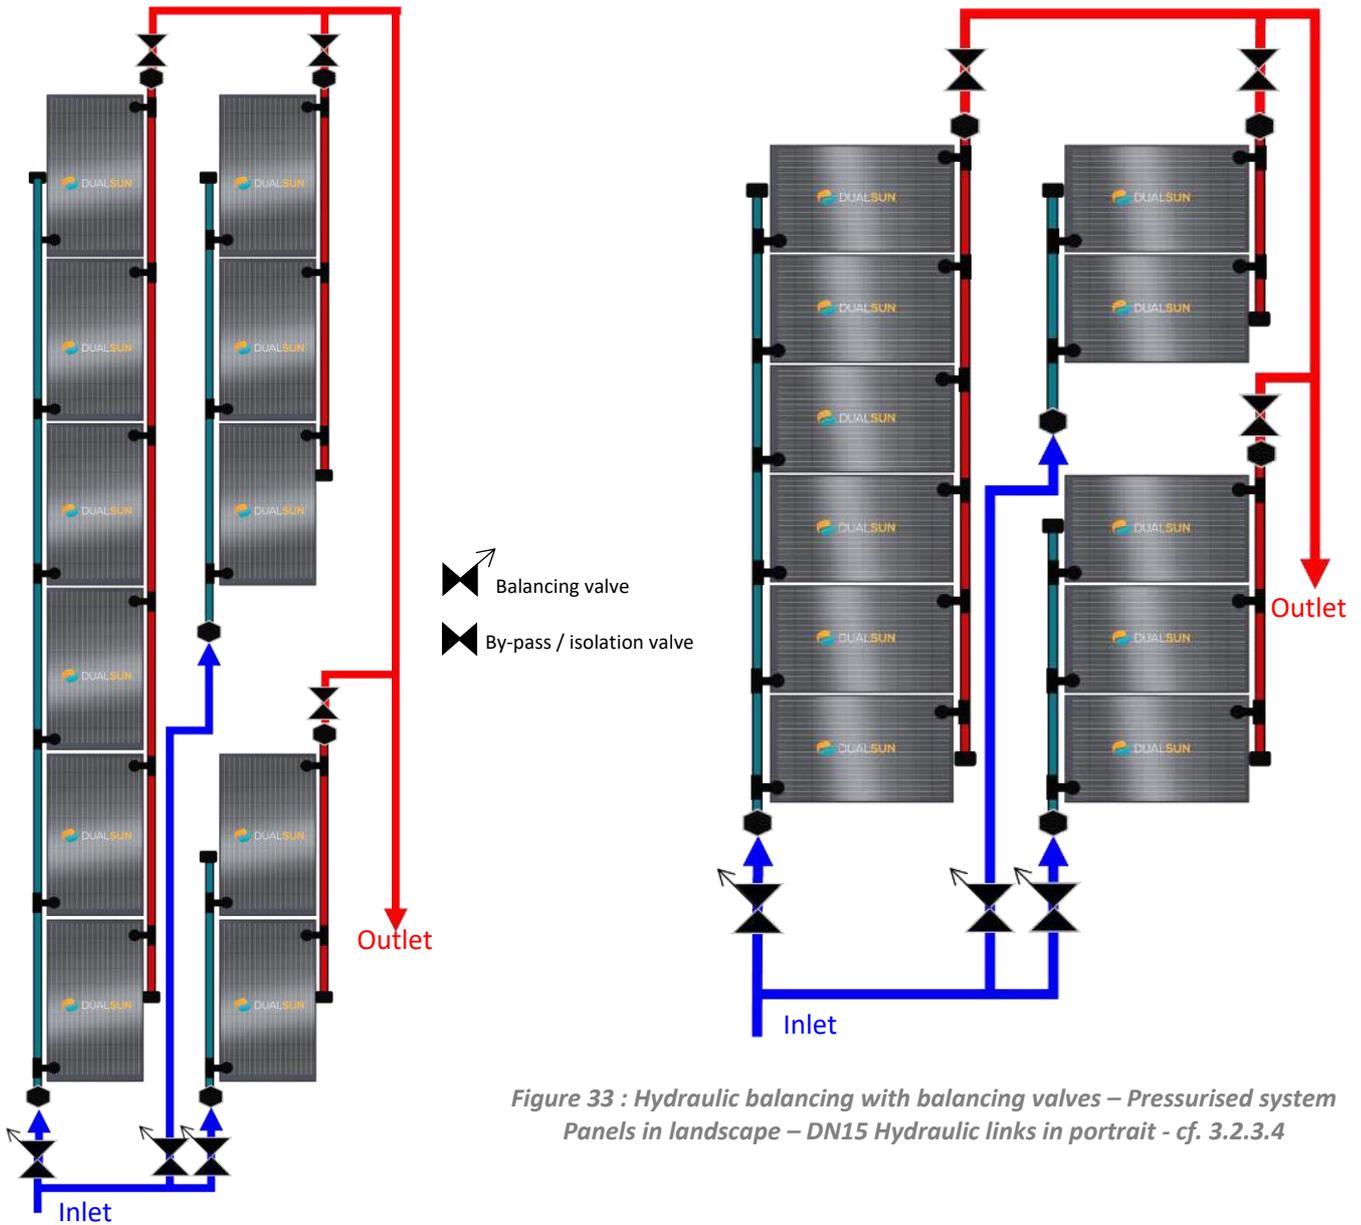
Hydraulic balancing with balancing valves – Pressurised system
